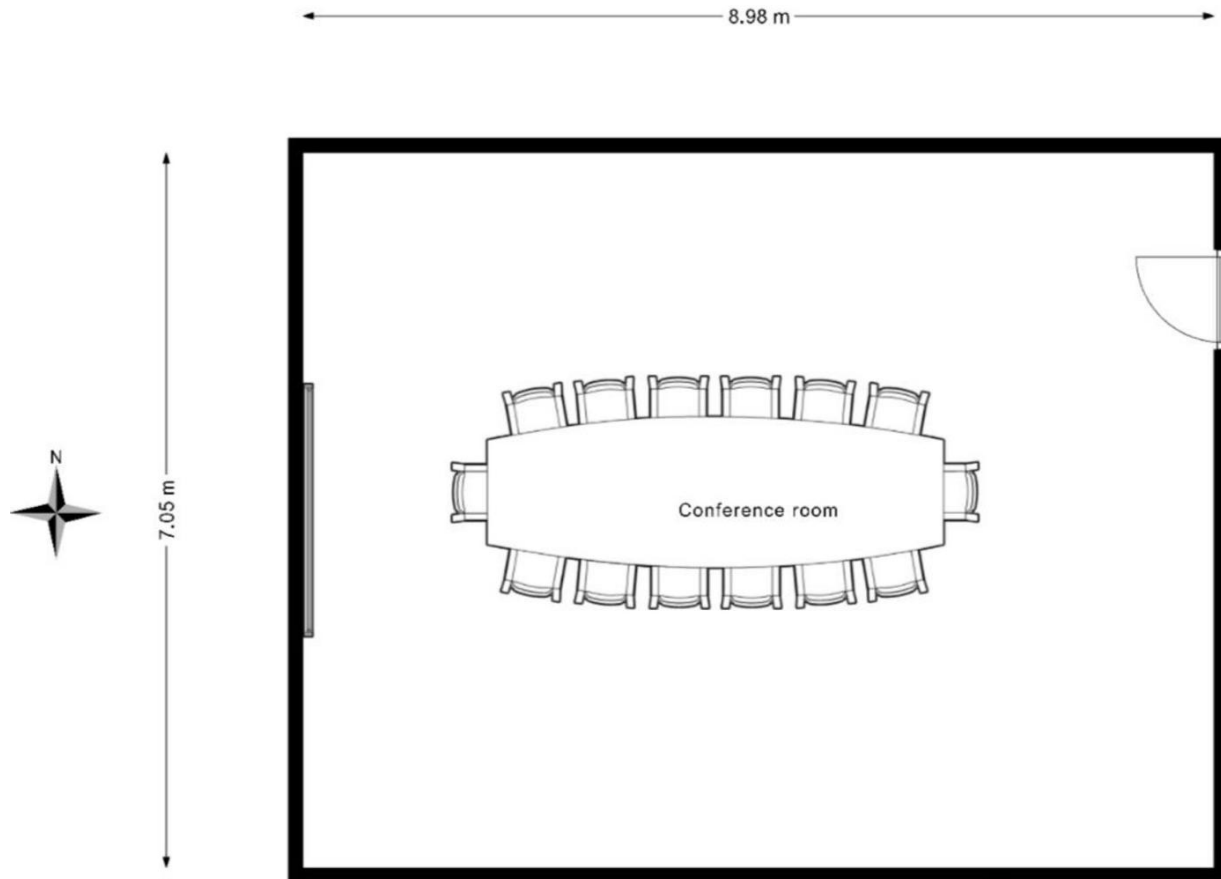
Conference room floor plan (all dimensions are in meters)
